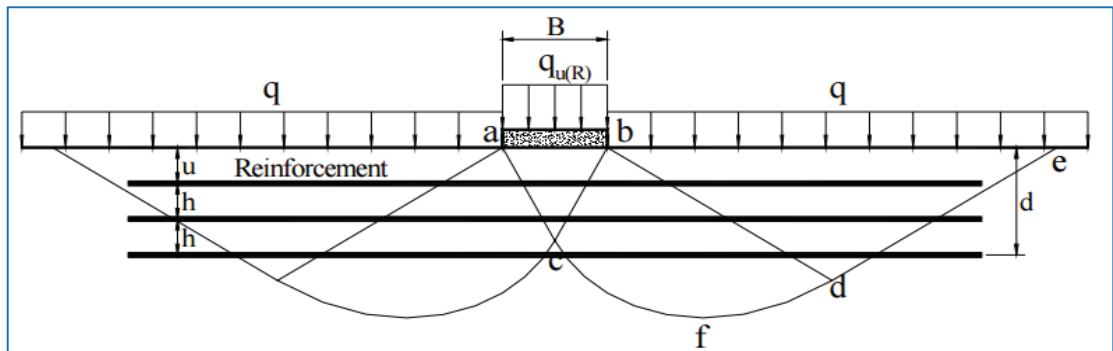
failure mode of reinforced soil foundation-failure within reinforced zone (Sharma et.al 2008)
